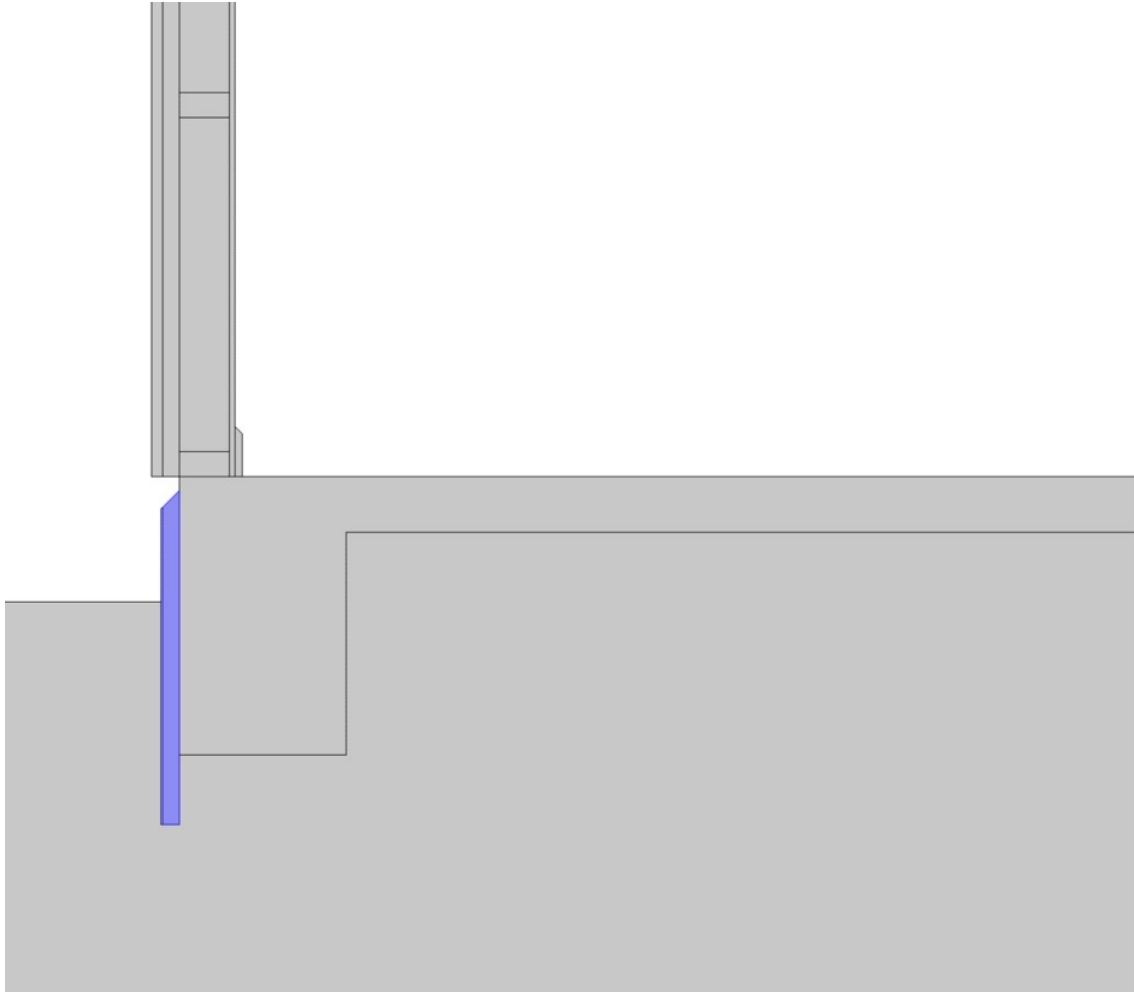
Configuration A: A simple concrete floor foundation and timber-framed wall, with perimeter insulation (shown in blue) added to the exterior side face of the slab.
